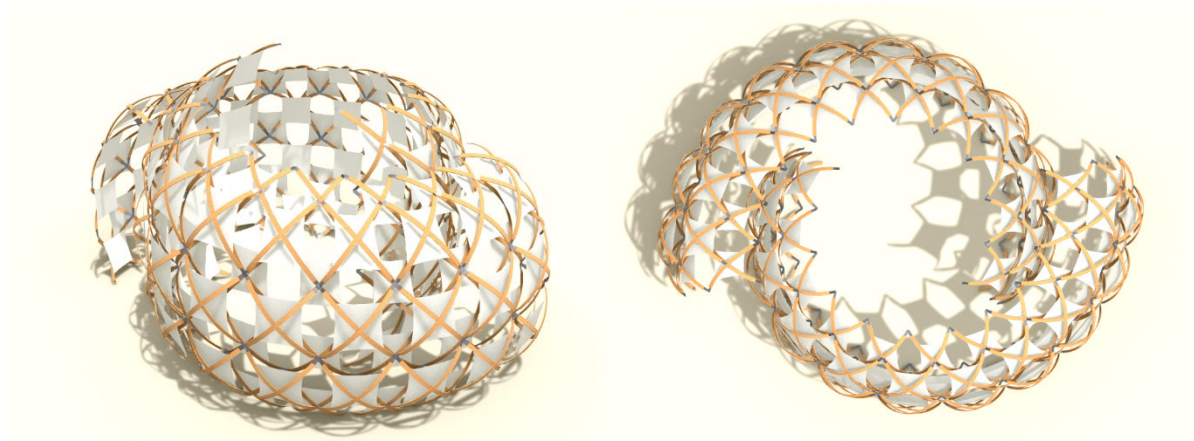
Design proposal of the Rethinking Lightweight Pavilion
